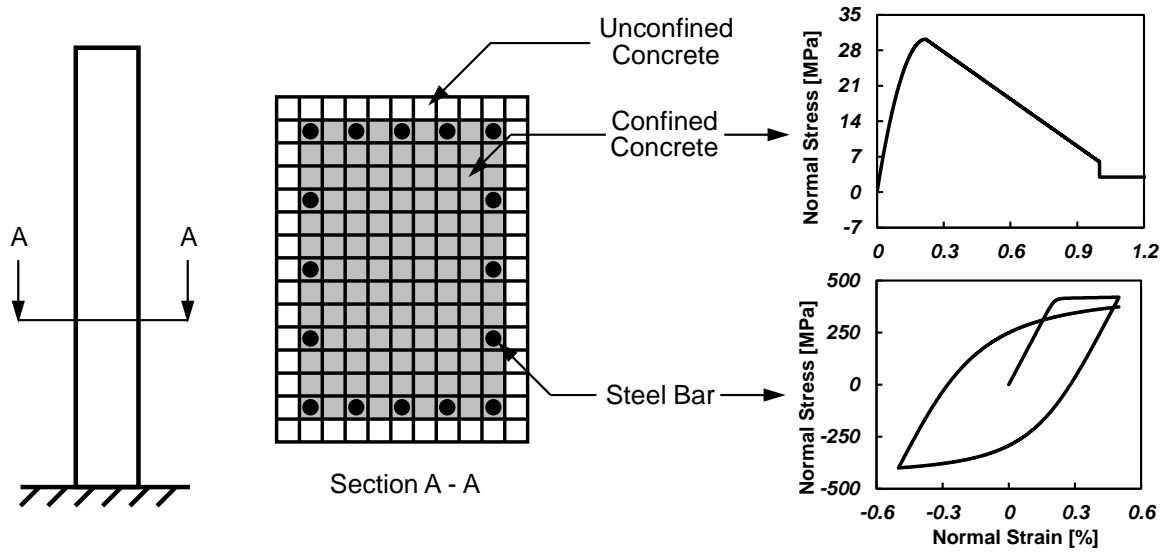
Schematic of a bottom-fixed column modeled with concrete and steel fibers.
